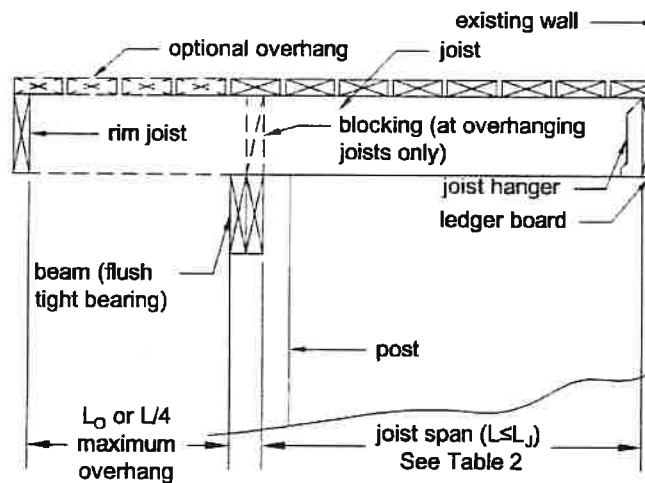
B. Joist Span – Joists Attached at House and to Side of Beam.
